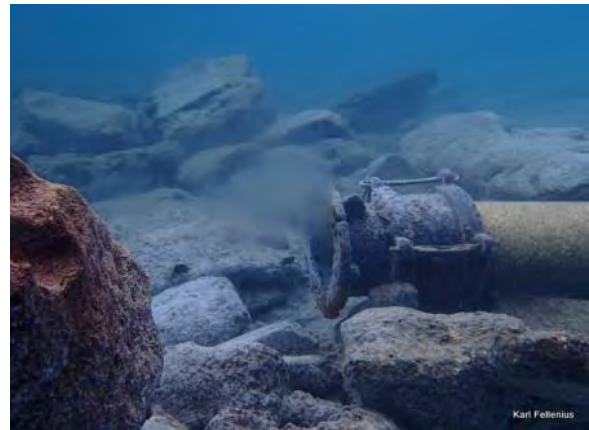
From Betio end of existing pipe, looking West, corrected height +0.8m
